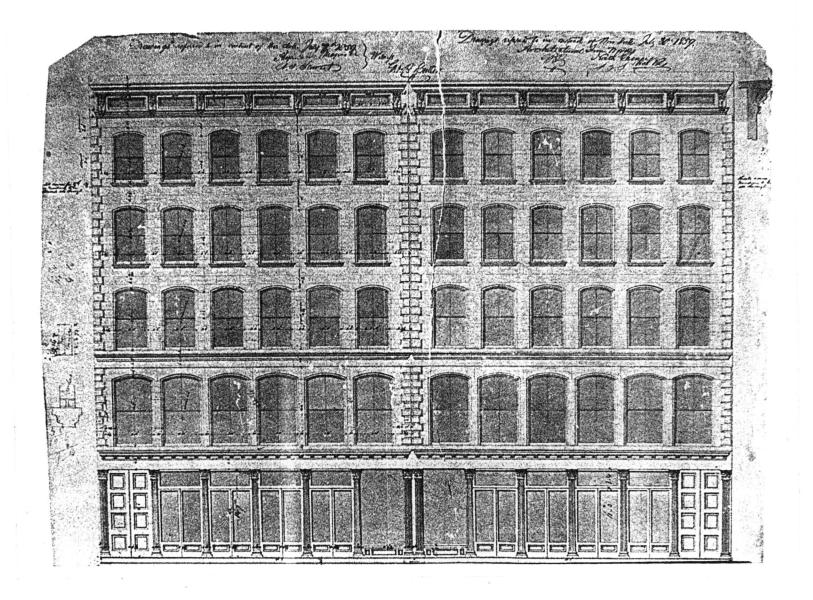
John B. Snook, Design for the store and loft building at 96-102 Reade Street, 1859-60.
